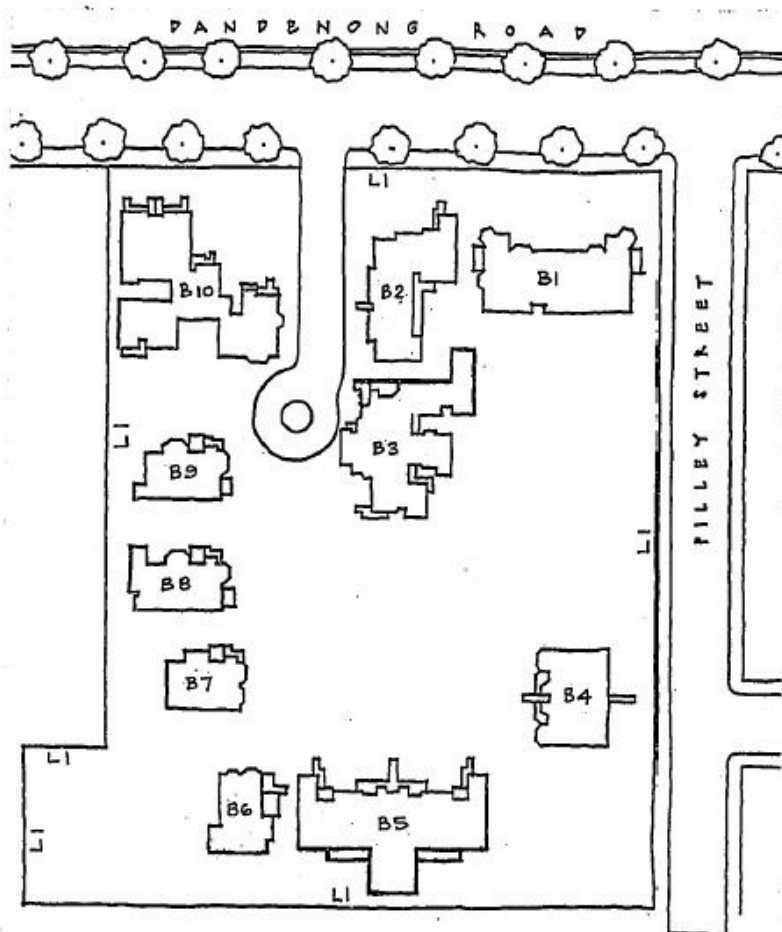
Heritage Victoria plan of 'Ardoch' showing significant buildings
